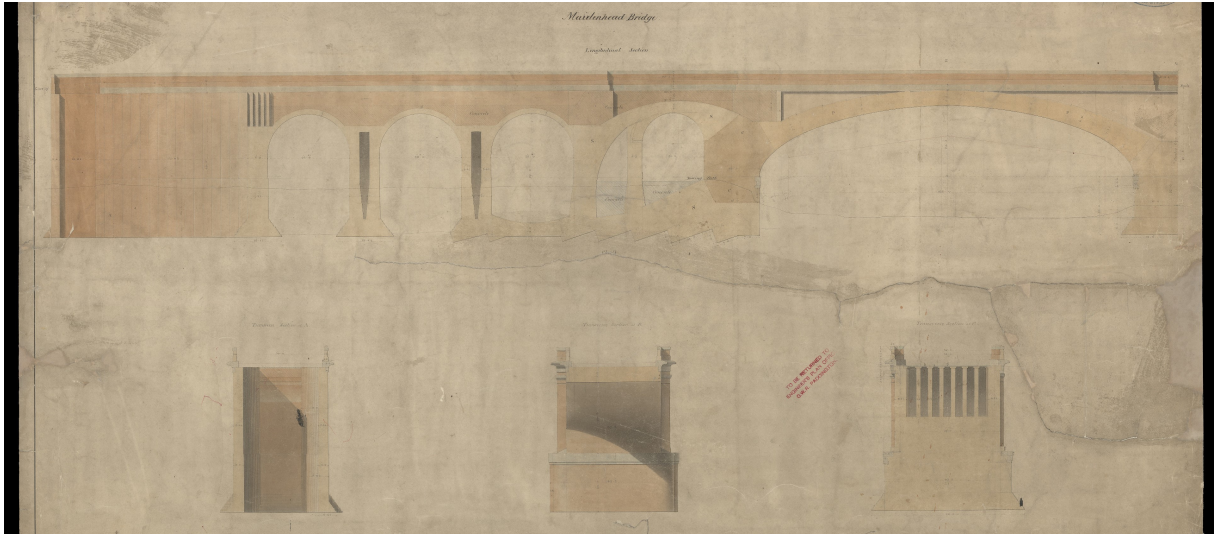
Elevation of Maidenhead Railway Bridge, image from Network Rail Corporate Archive.
